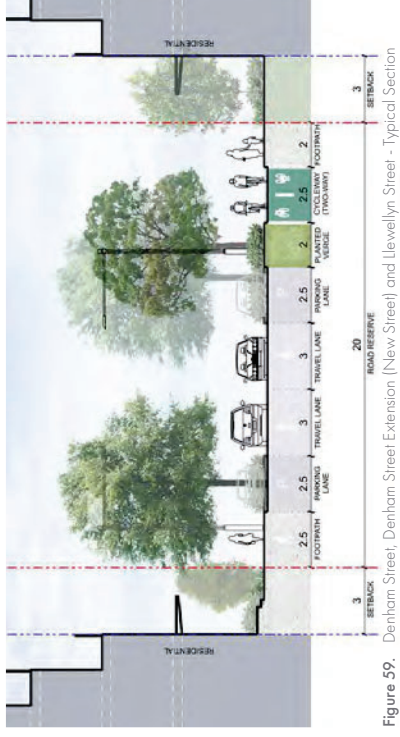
Denham Street, Denham Street Extension (New Street) and Llewellyn Street - Typical Section
